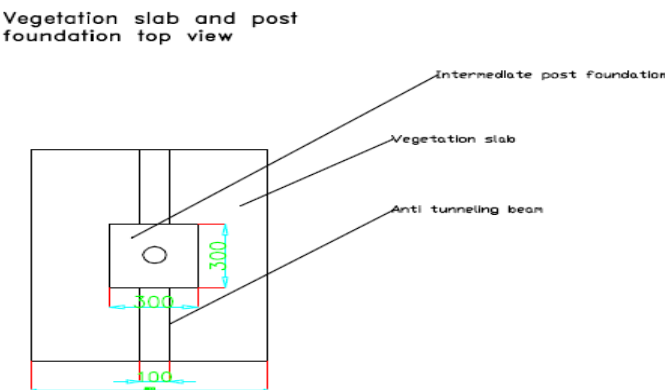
Vegetation Slab and Anti-tunnelling Beam Plan Layout
